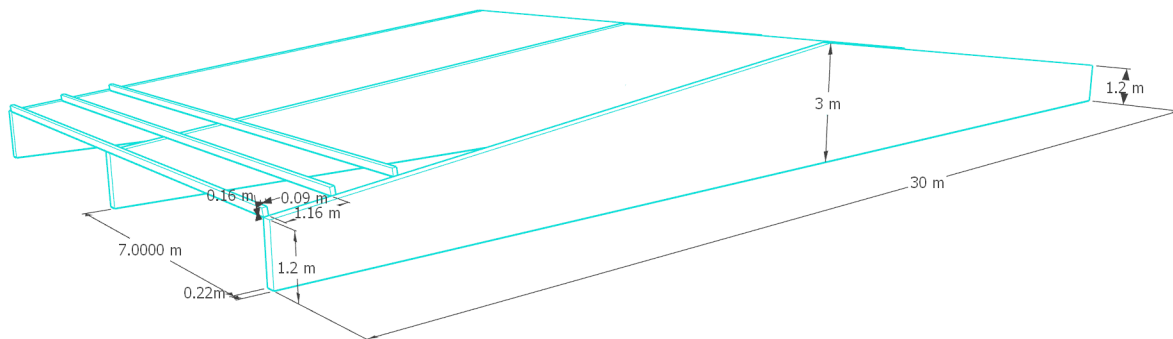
GLT roof truss spacing, dimension and structural consideration (Illustration done by author adopted from (Simón-Portela et al. 2023))
